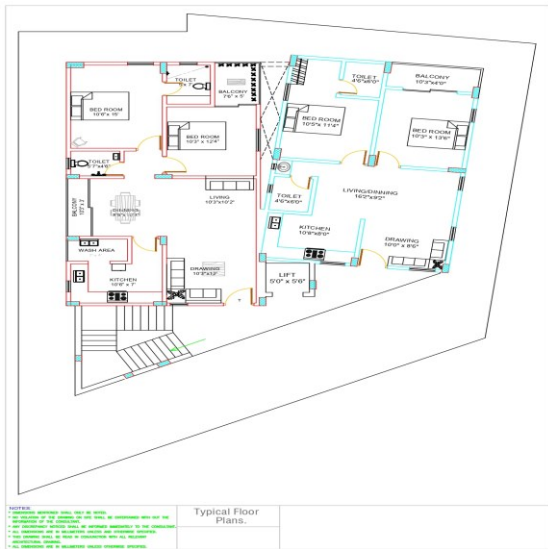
Architectural plan of the Apartment Building of Typical Floors with Conceptual Columns.
